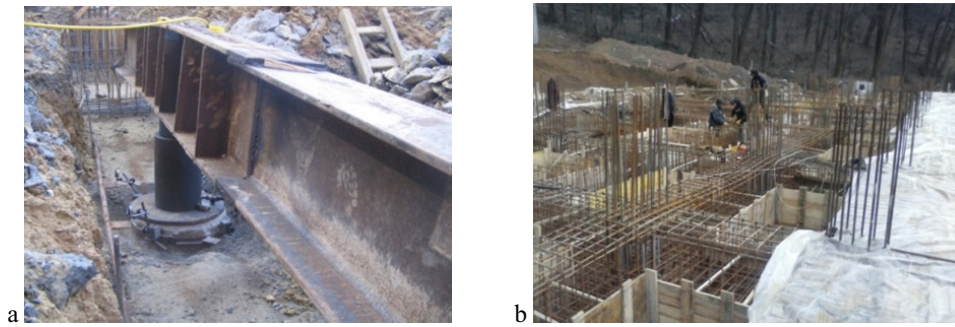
(a) View during pile's test; (b) Foundation beams networks reinforcement.
